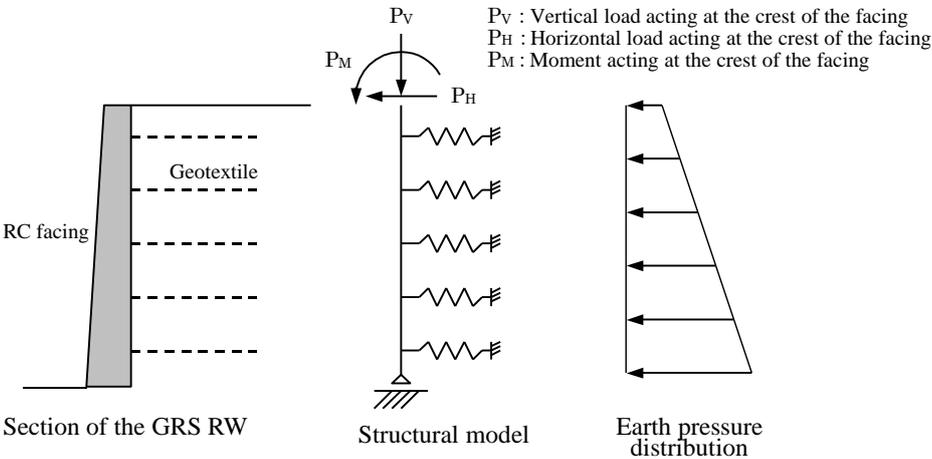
Structural model of RC facing of GRS RW
